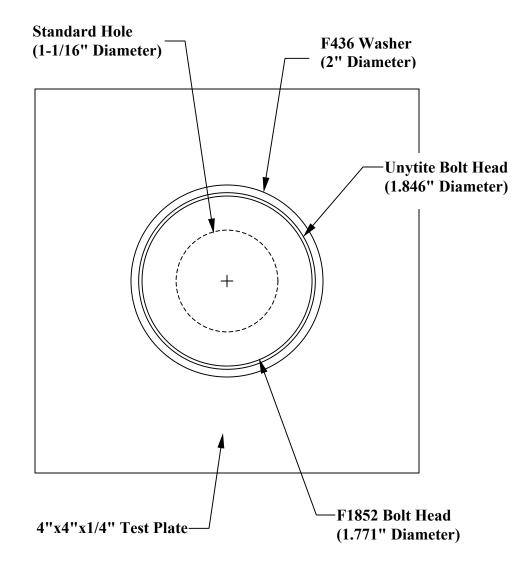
Bolt and Plate Layout for 1" Bolt in Standard Hole (Drawn to Scale)
